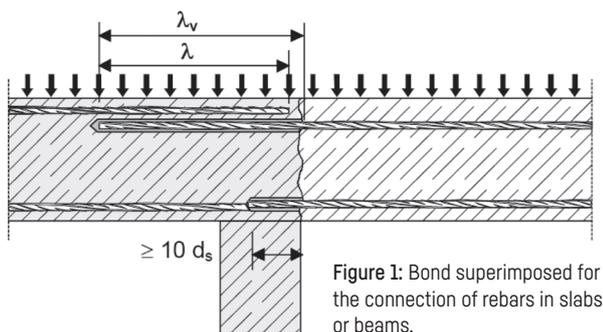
Bond superimposed for the connection of rebars in slabs or beams.
